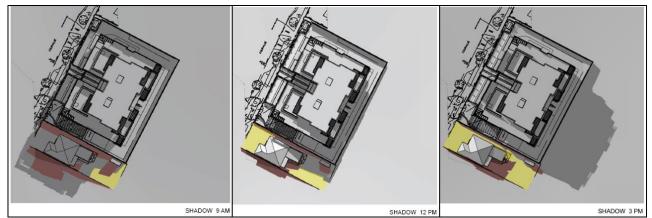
Proposed degree of overshadowing to southern adjoining property.
